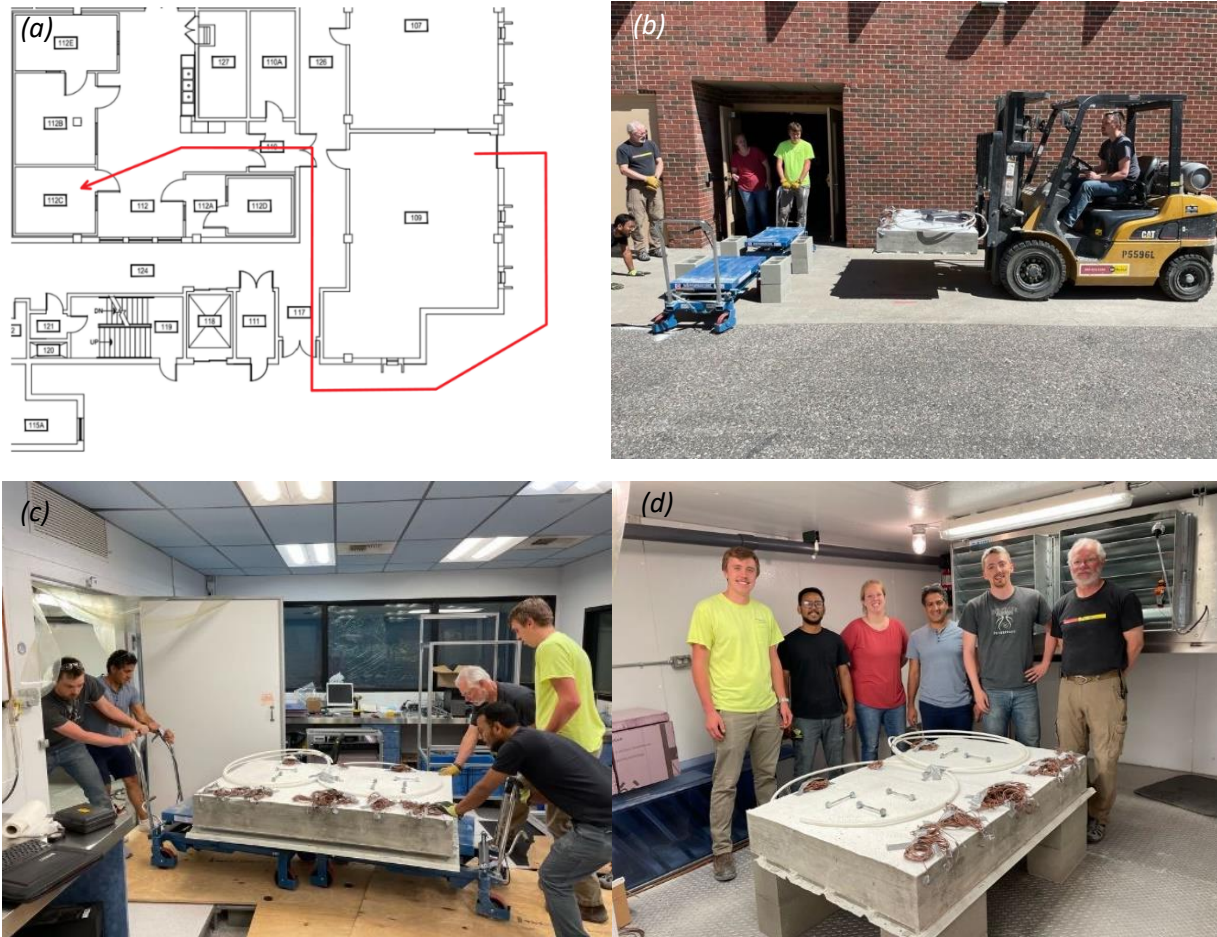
a) Path to CHC, b) transferring bridge deck model to hydraulic scissor lift tables, c) entering the CHC, and d) final bridge deck model position
